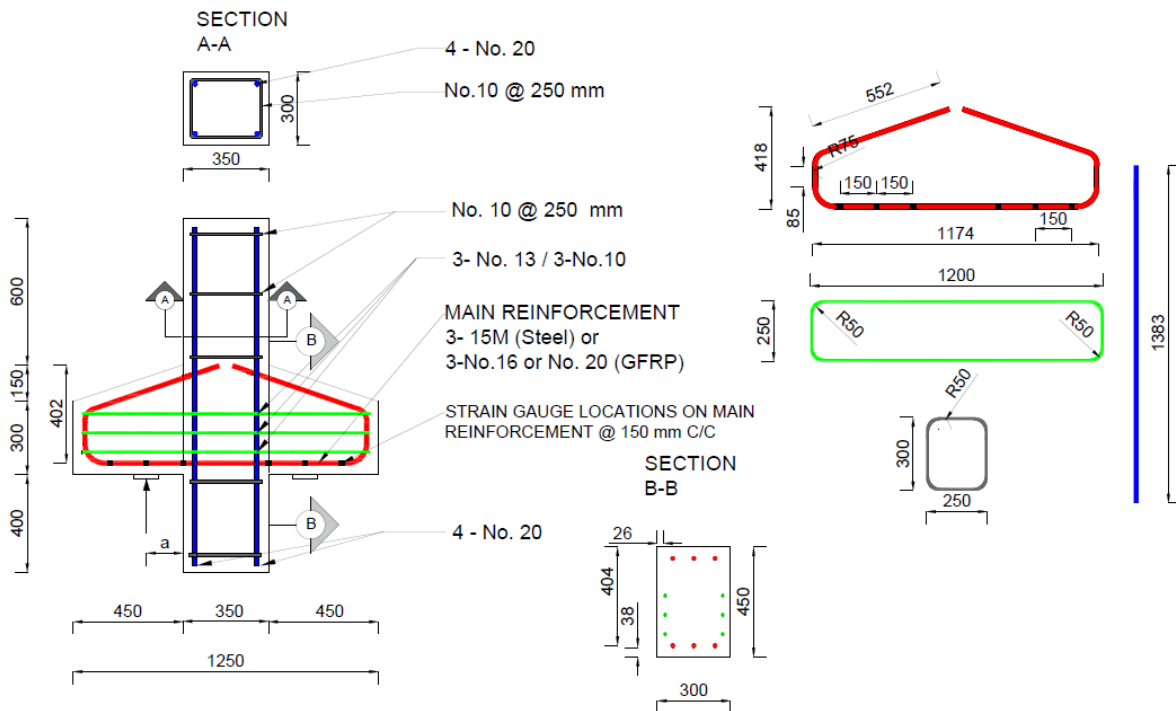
Geometry and reinforcement details of the corbel. (Dimensions in mm.)
